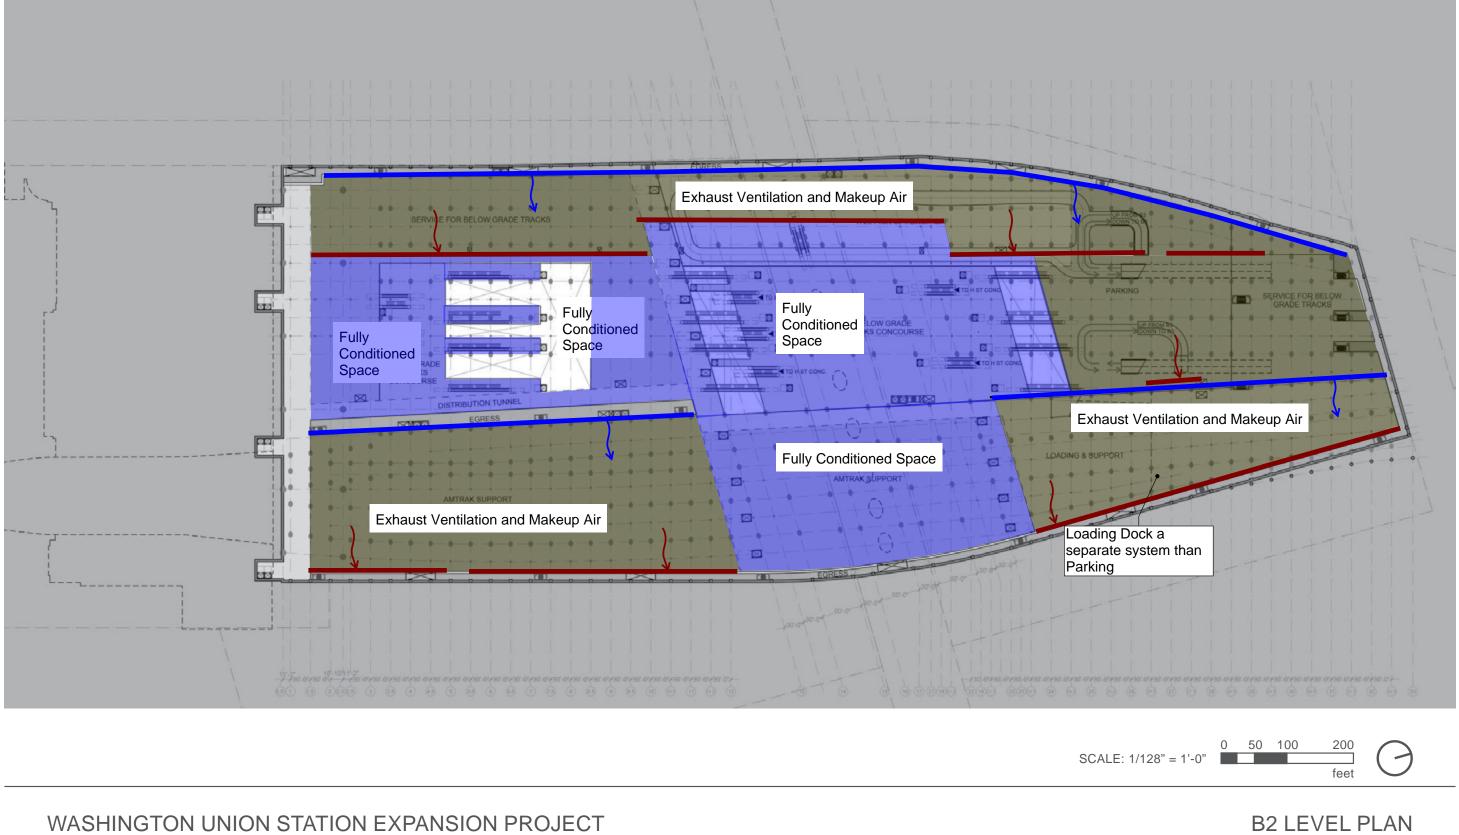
B2 Level Plan with Below Grade parking and tracks
